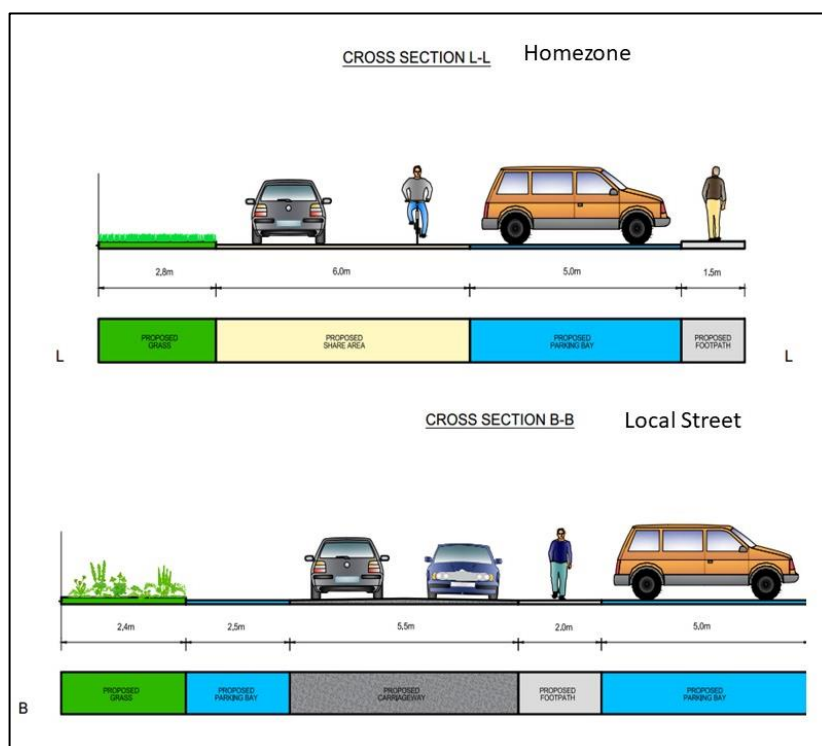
Typical Cross Sections for Masterplan Streets
